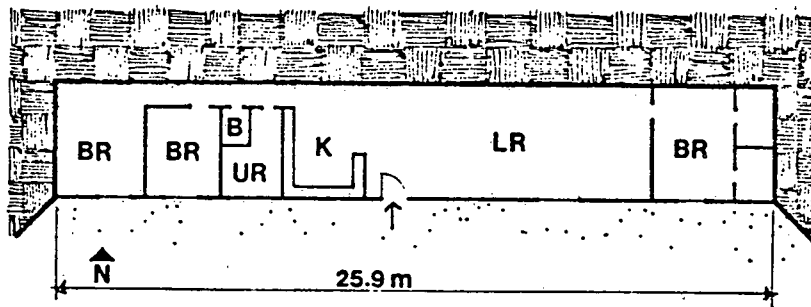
Site A is a relatively small, narrow insulated concrete structure with the exposed wall facing south.
